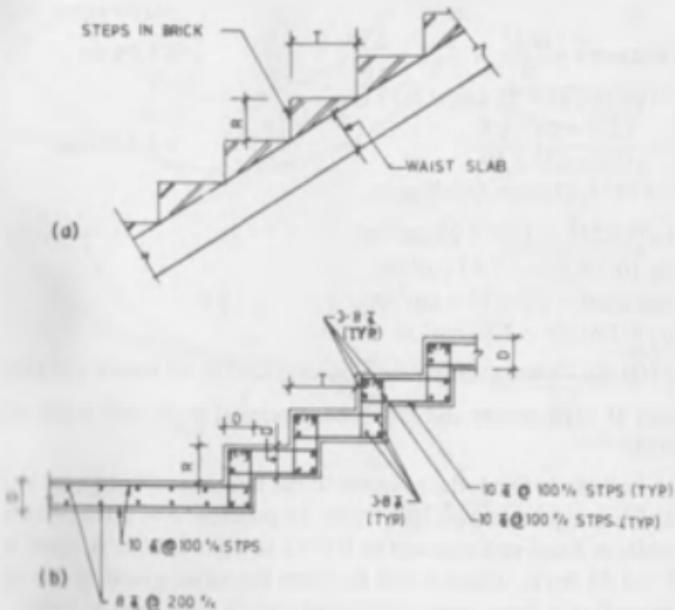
Slabless stairs. (a) Common stairs (solid slab with steps in brick work); (b) slabless stairs.
